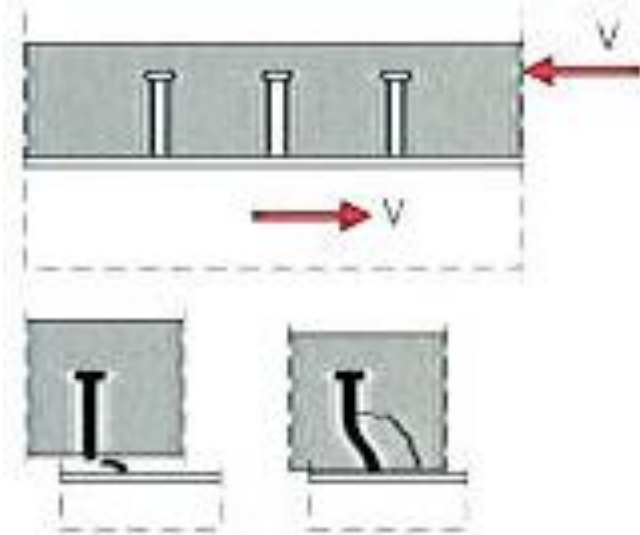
Failure Mechanisms of Dowel connections in Concrete. (Bottom Left) Shear of the Dowel. (Bottom Right) Concrete Bearing Failure<sup>285</sup>
